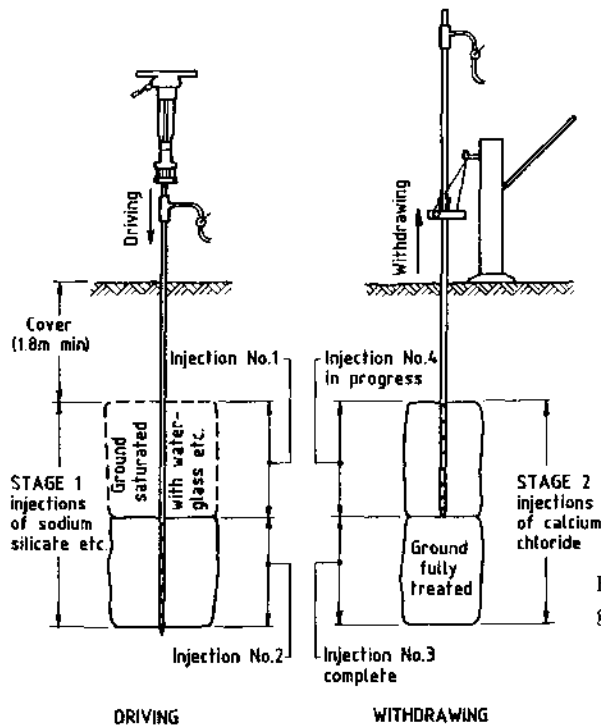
Open bottom hole method of grouting (Littlejohn 1985).
